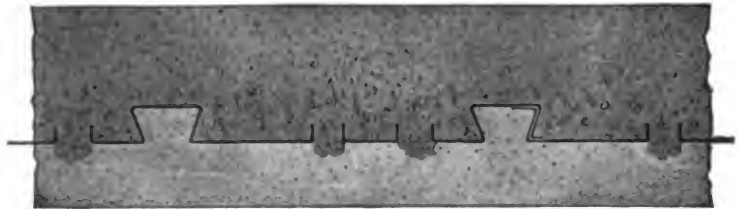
SHOWING STRONG BOND BETWEEN KEYRIDGE CONCRETE AND PLASTER
